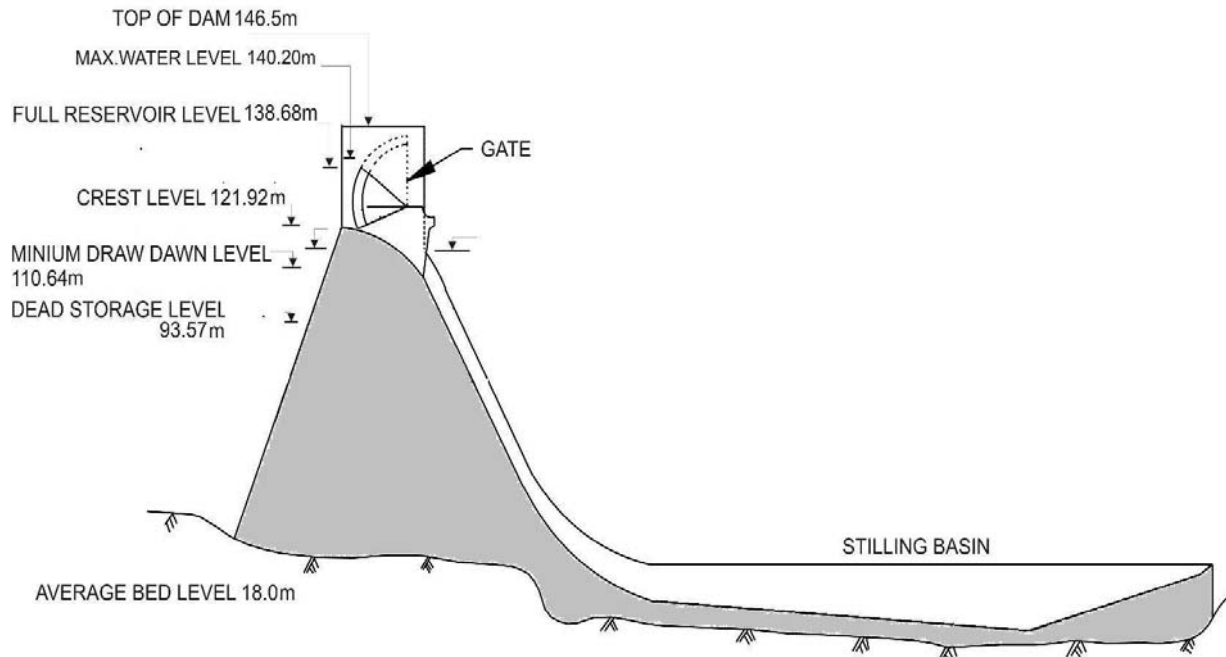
SECTIONAL VIEW THROUGH SARDAR SAROVAR DAM SPILLWAY
